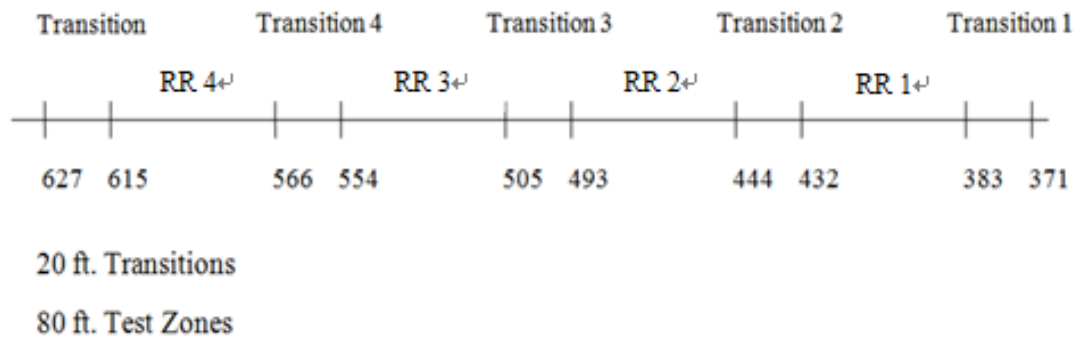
Ballast Test Sections Constructed in Section 3 of the High Tonnage Loop
